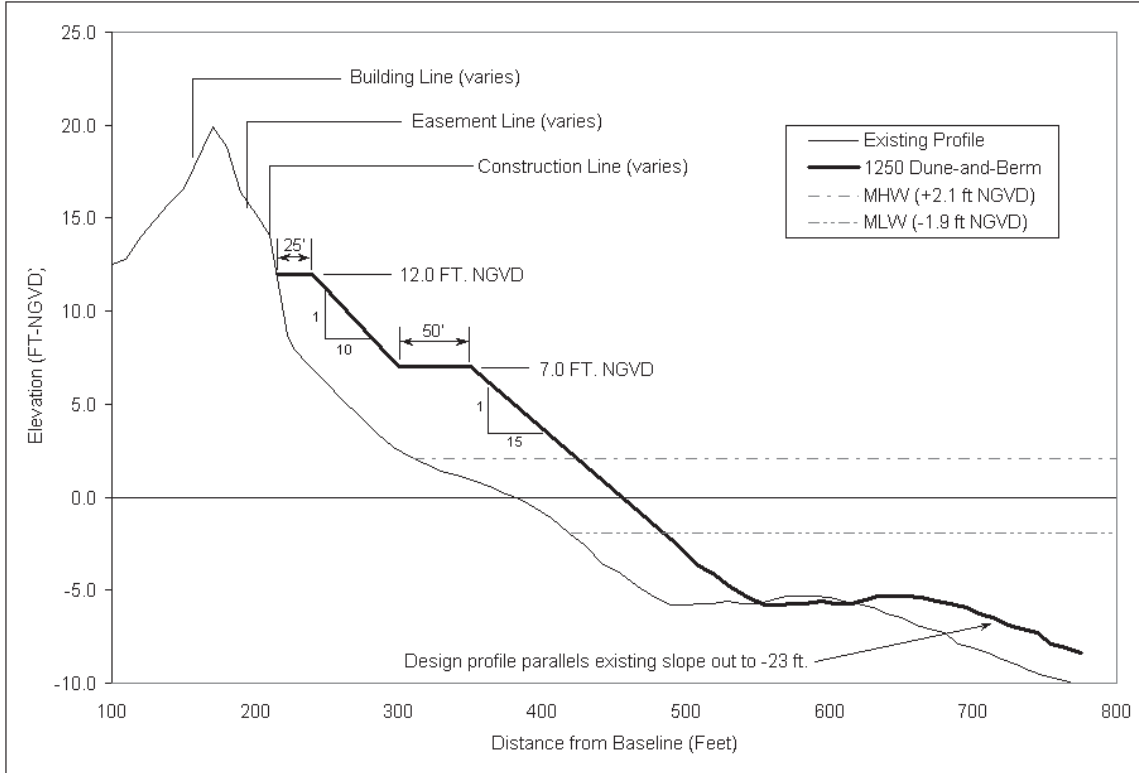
Plan 1250X, Locally Preferred Plan, Cross Section
